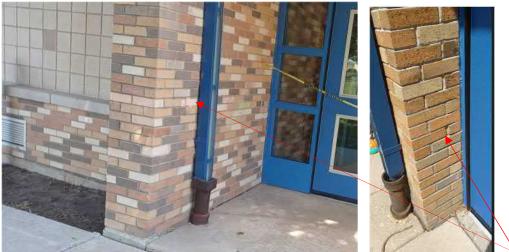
Piers by doors 7 and 8 spalling / popping bricks in need of replacing and tuckpointing.
